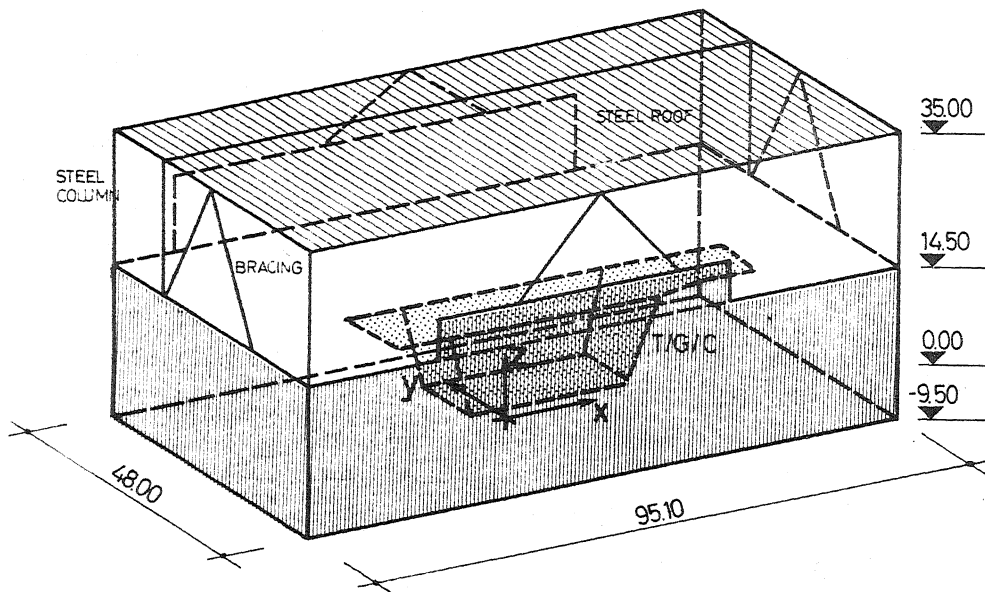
STRUCTURAL COMPONENTS OF TURBINE BUILDING
